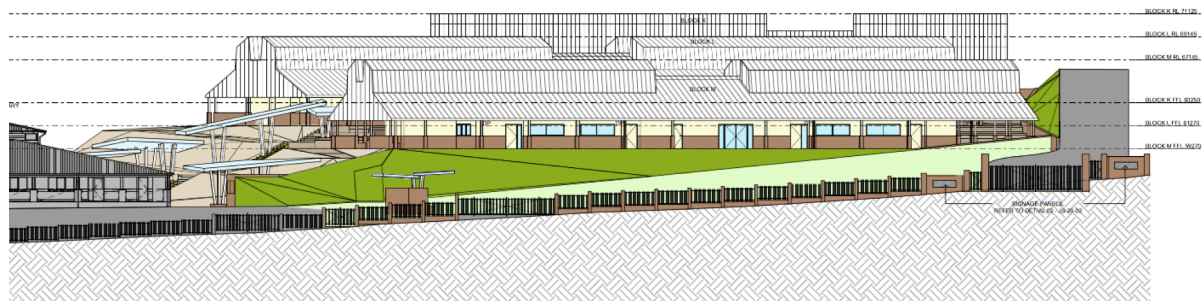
Excerpt of Worcester Road elevation (drawing MP-JS-20-02). Block M will be visible from Worcester Road, while blocks L and K will be screened from the road perspective.
